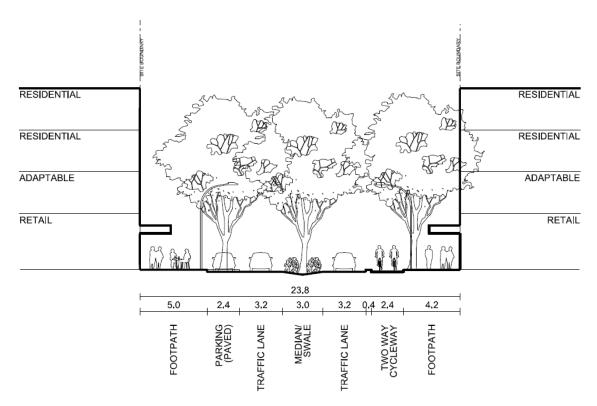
Section B – Main Street Typical Section – 23.8m (Archibald Avenue)
